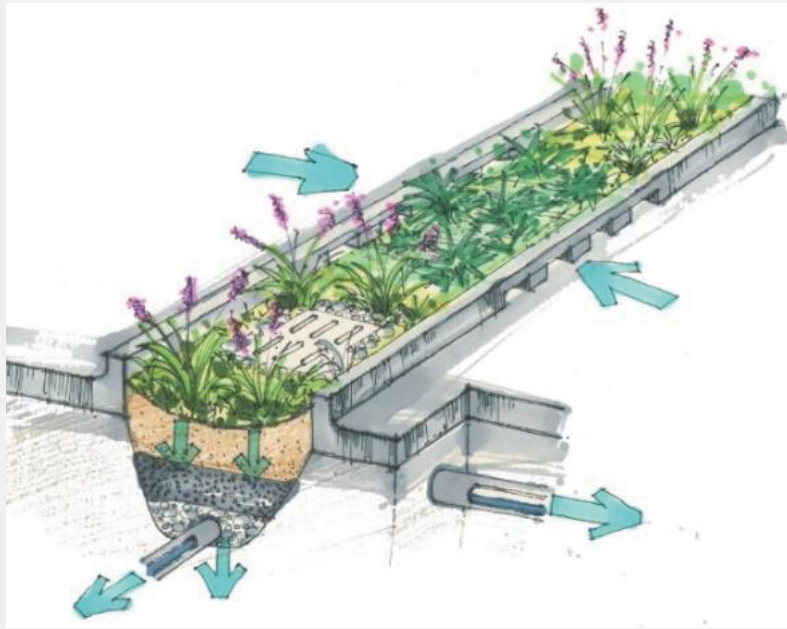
The design of bioretention catchment and greenbelt next to driveways
